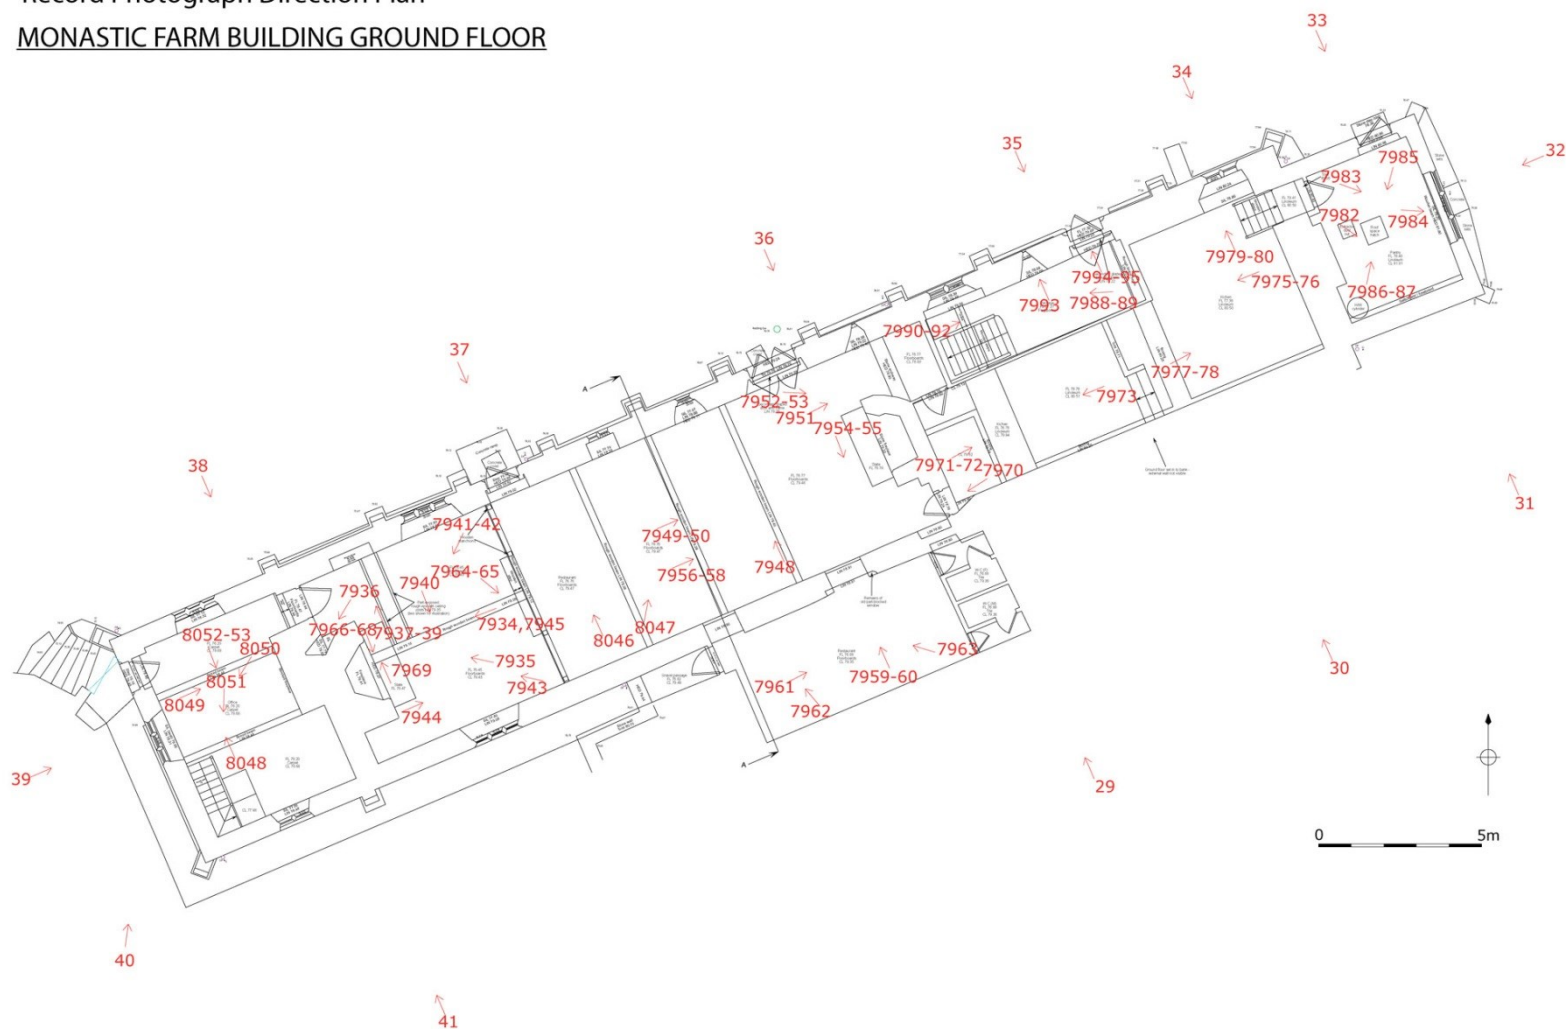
Photo direction plan – Monastic Farm Building: Ground floor.
